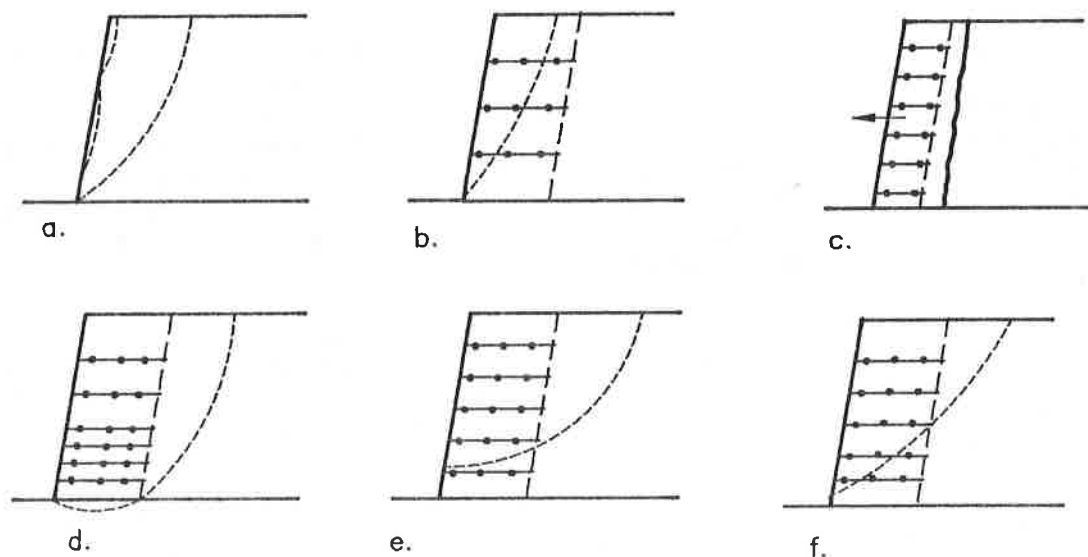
POTENTIAL FAILURE MODES OF REINFORCED SLOPES
